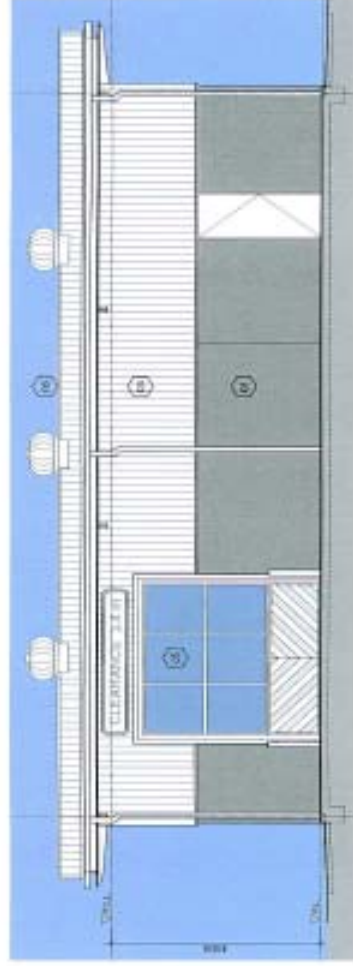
Rail Provisioning Area (Section and Elevations)
